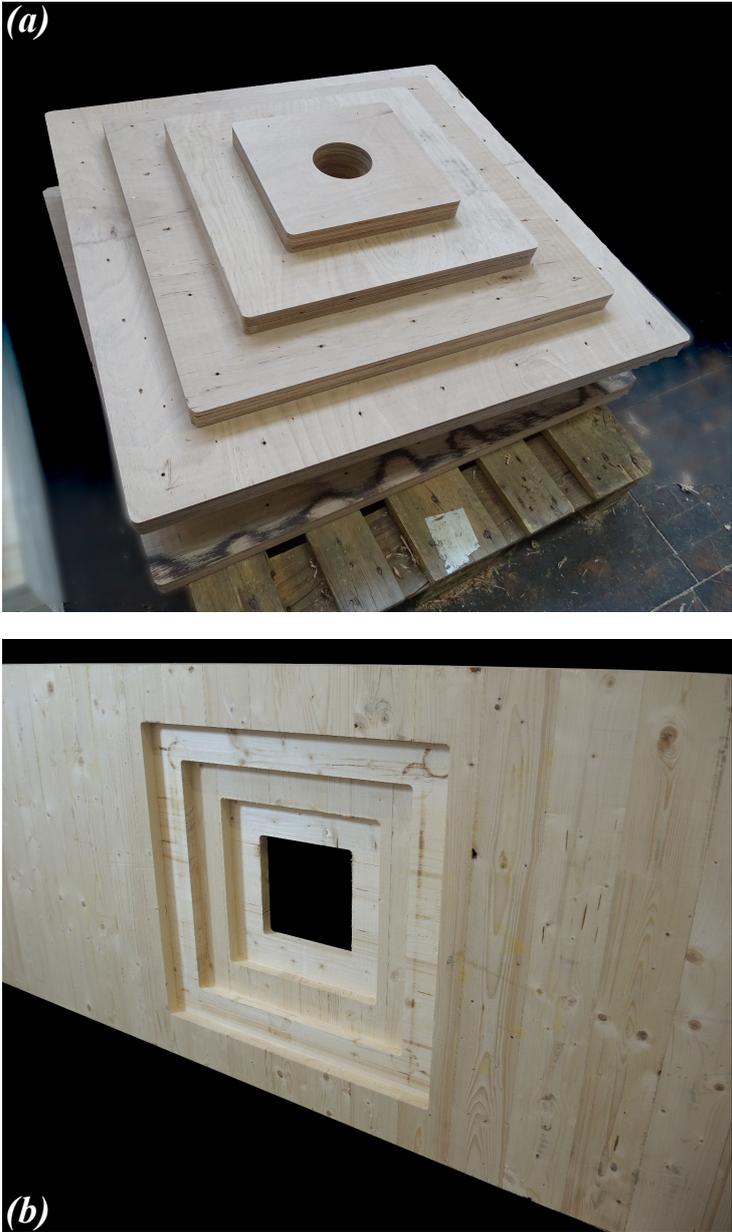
Milled prototypes of the elements of the connection: (a) pyramid-type insert; and (b) pyramid-shaped cavity milled in the CLT
